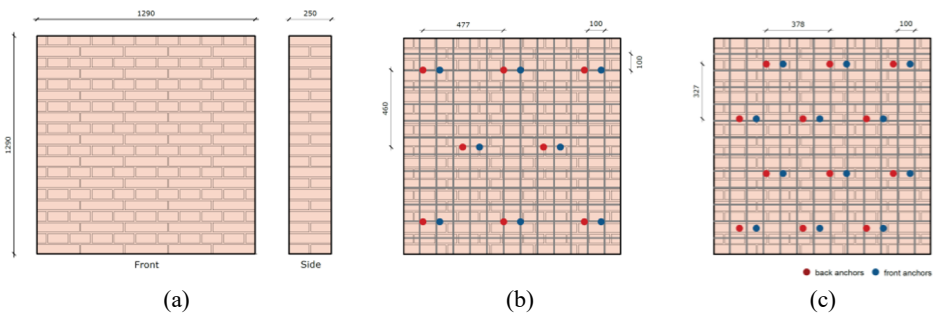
Geometry of masonry specimen (a) and reinforcement configuration with 8 (b) and 12 (c) anchors.
